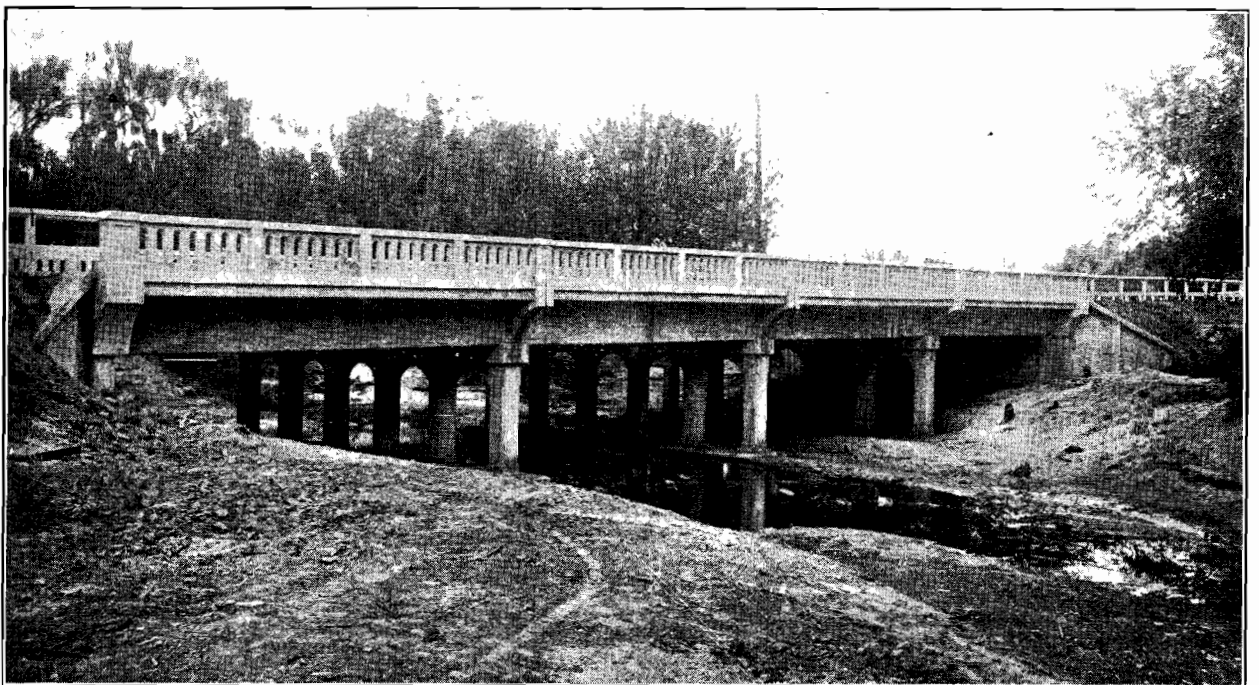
Showing completed structure over Barongarook Creek at Colac.
